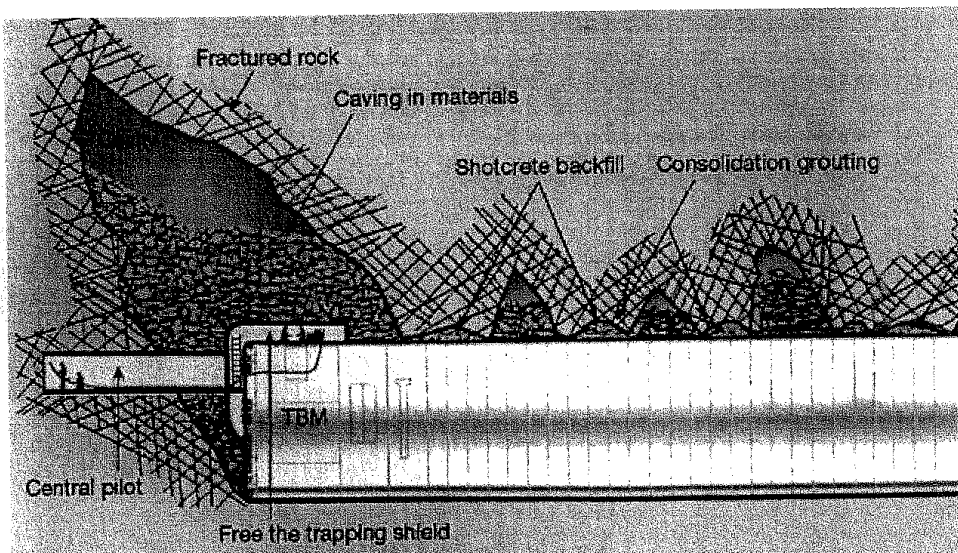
Trapped TBM and excavation method at Pinglin project (from Shen et al., 1999).
